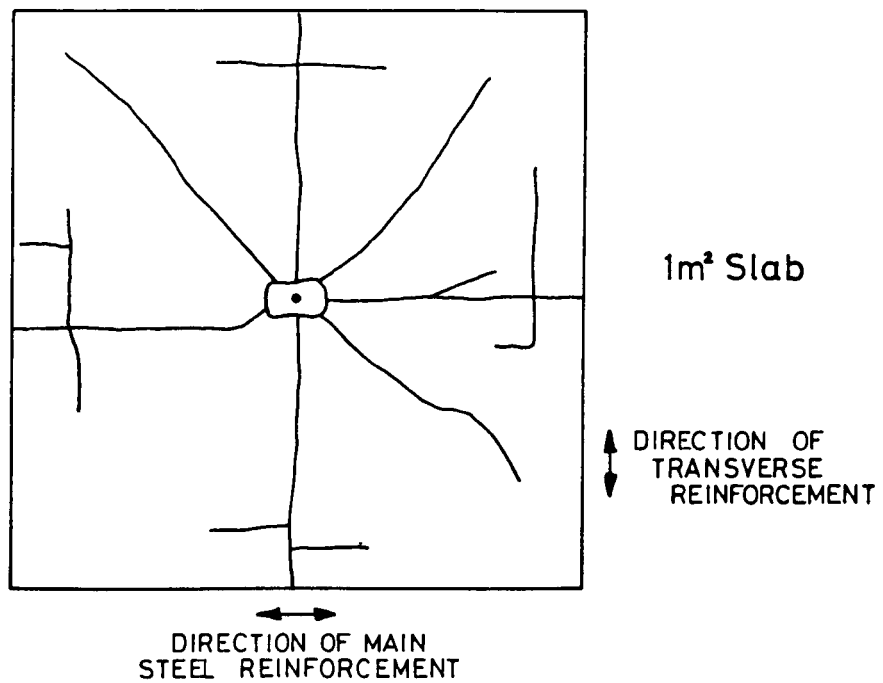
CRACKS IN A REINFORCED SAND/GRAVEL CONCRETE SLAB BY A 16g CHARGE IN SAND ('DAMP' OR 'DRY' SAND)
